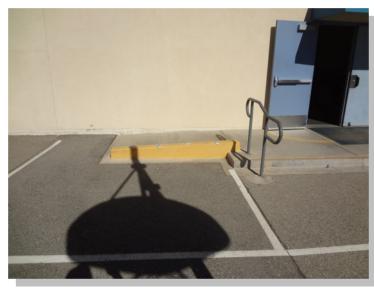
Some of the site work throughout the campus have not been built to current accessibility standards
